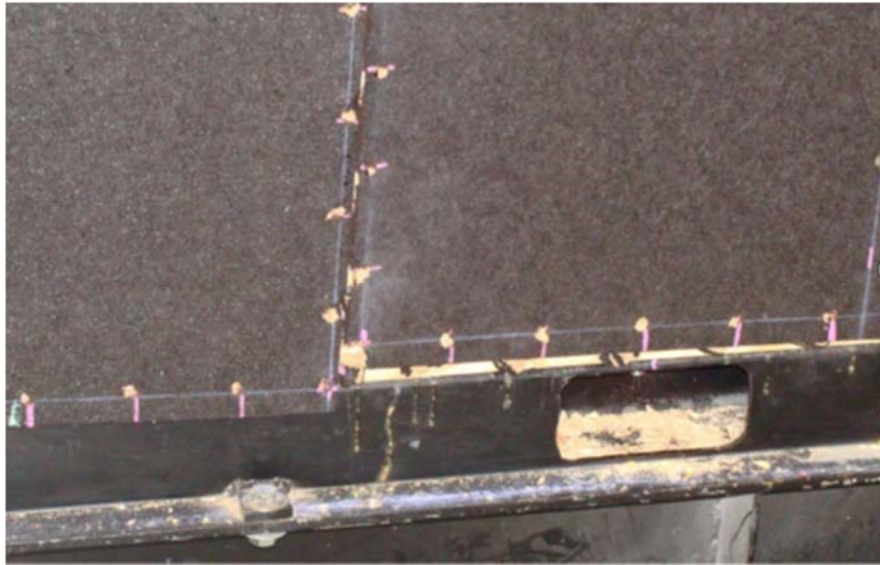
Typical Failure Modes Including Nail Head Pull Through and Sheathing Tear Out.
